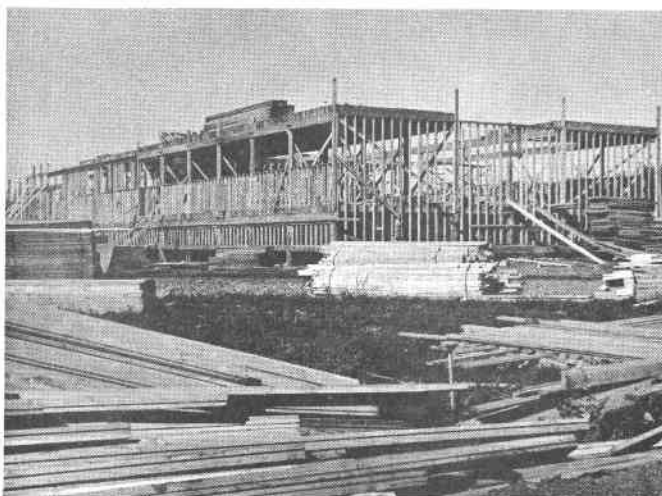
Pile foundations for hostel. Note airspace, false floor, and crawl space
